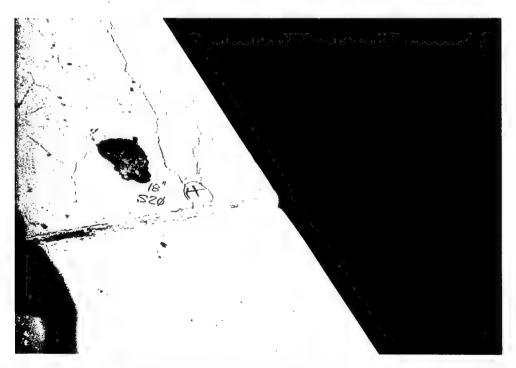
Cracks and stains in south seawall monolith S20 at joint 19/20
